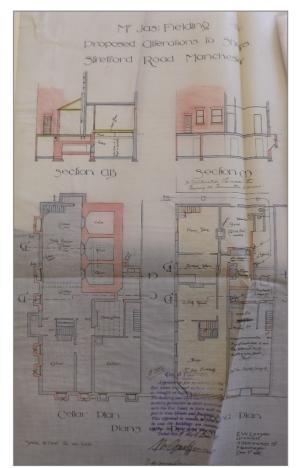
Plans of shop as proposed, Stretford Road, 1898
